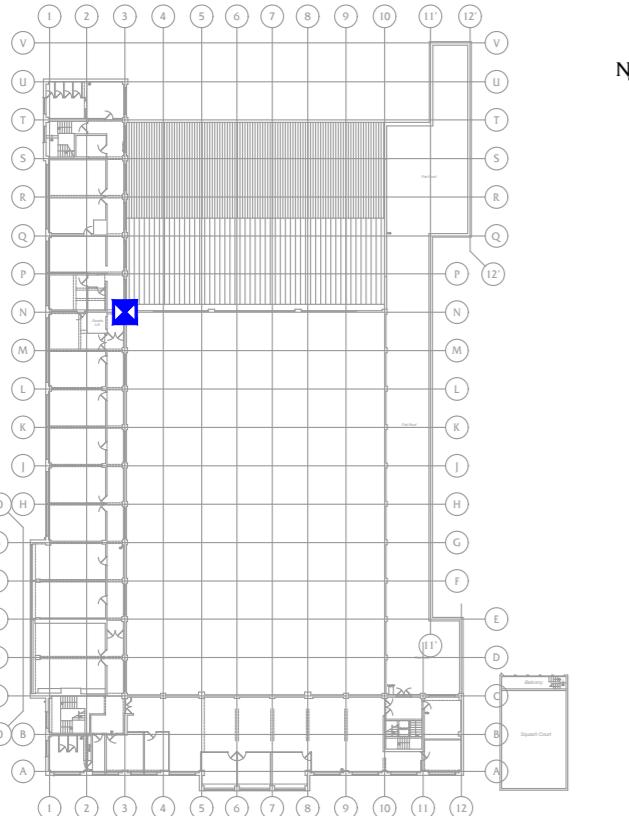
SCHEMATIC ELEVATION SHOWING BEAM / CHANNEL LAYOUT - SURVEY AREA N3 NOT TO SCALE
